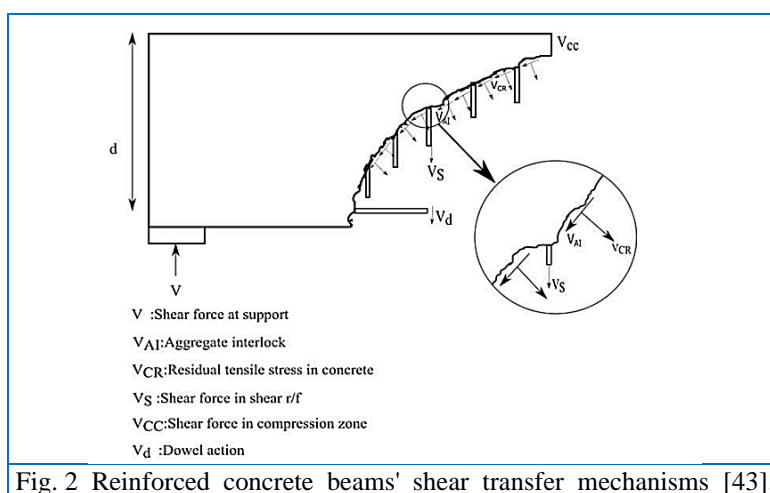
Reinforced concrete beams' shear transfer mechanisms [43].
